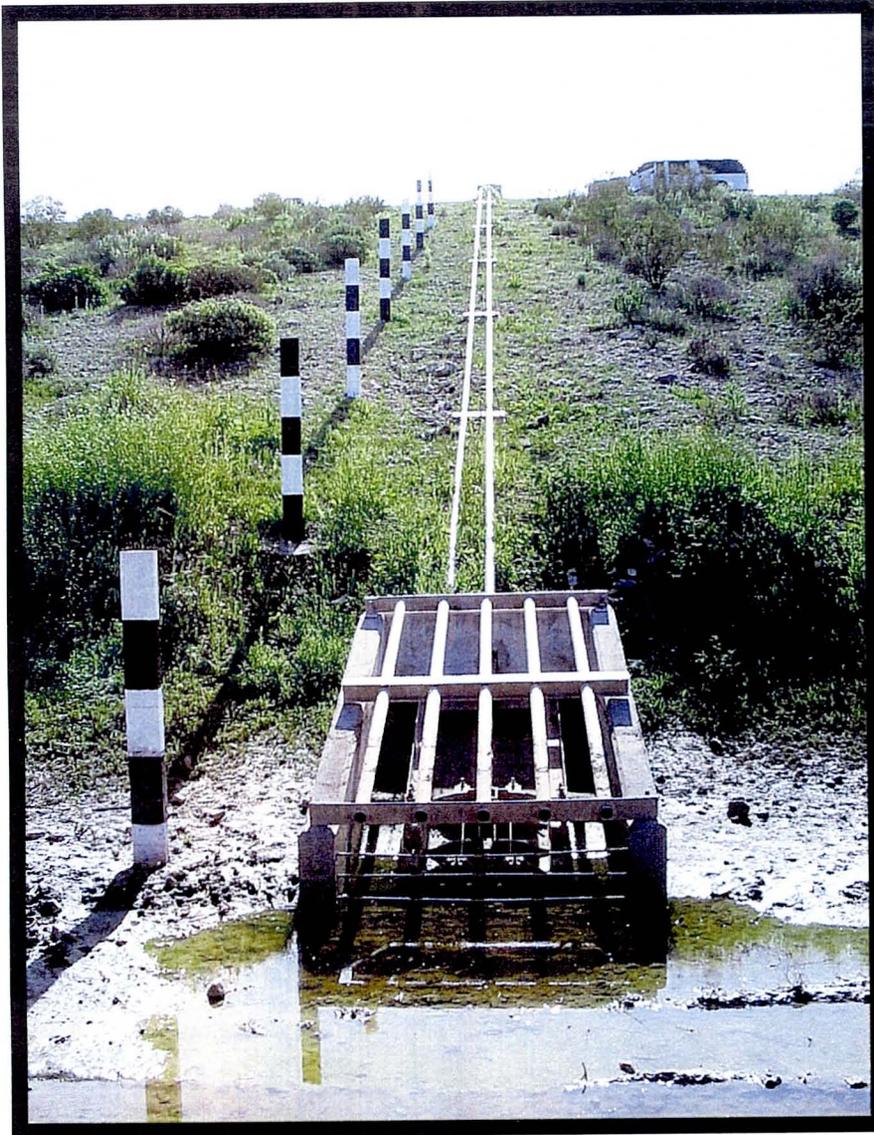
Drain Outlet at Station 746+00: Gate was closed.
